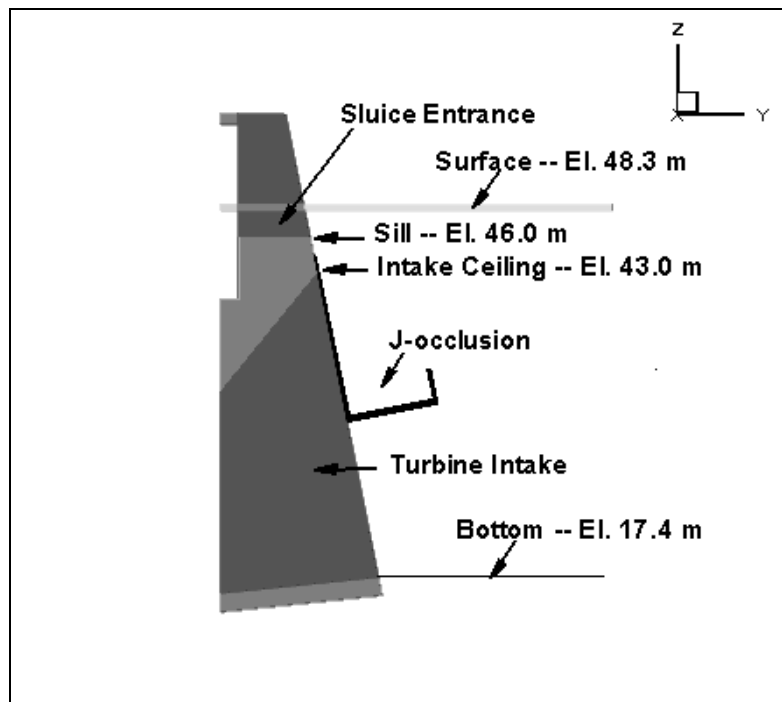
Sectional view of The Dalles Dam powerhouse showing sluiceway entrance, sill, turbine intake, and J-occlusion.
